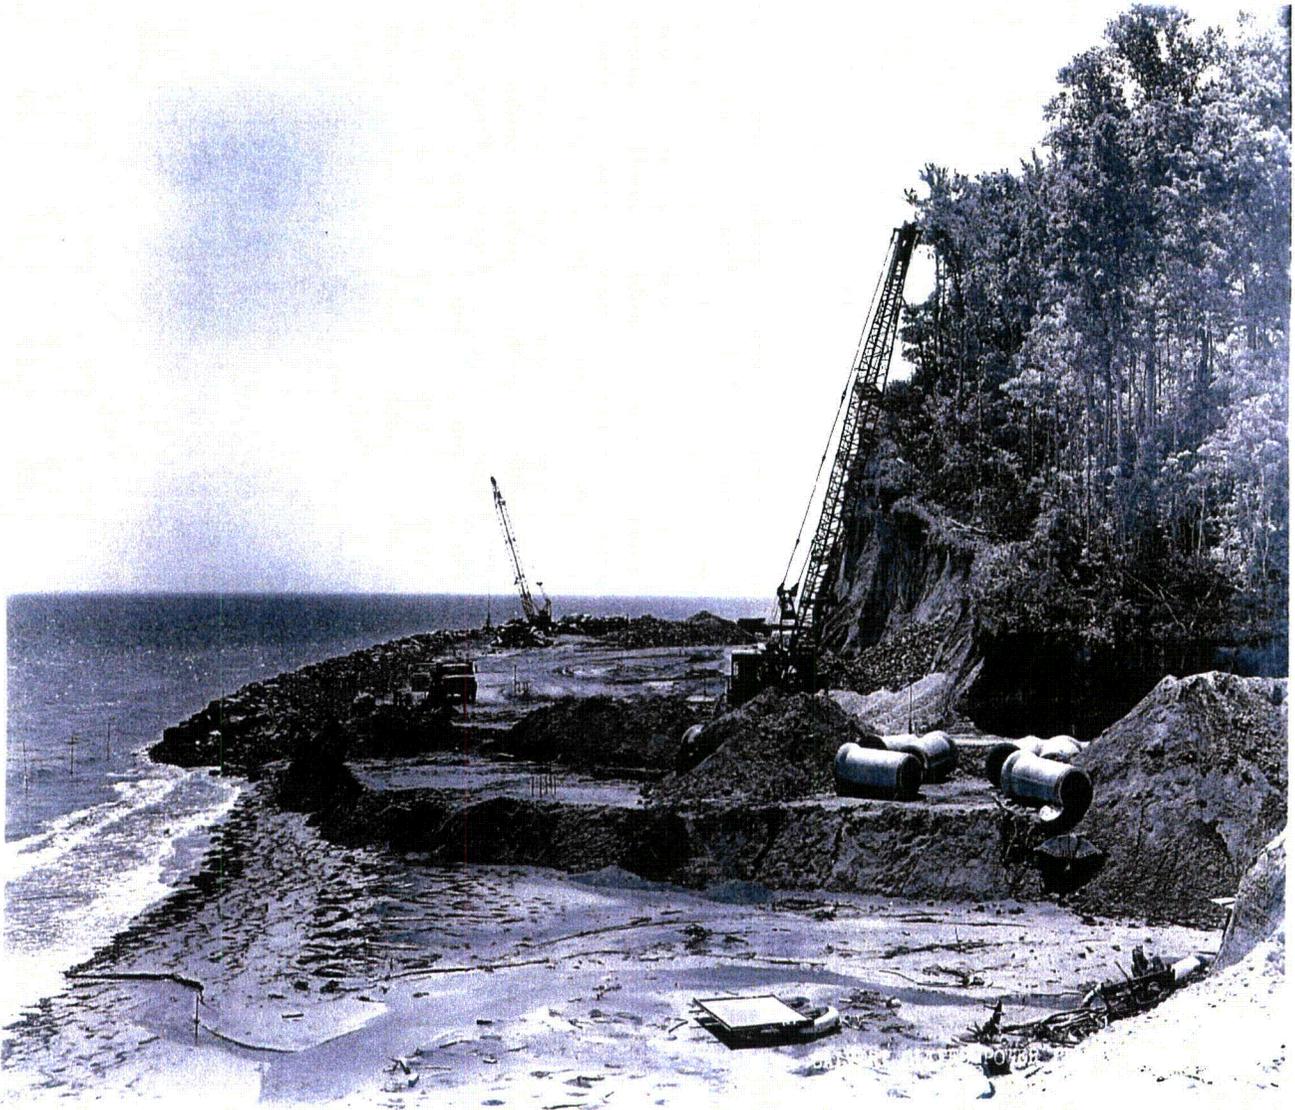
Aerial Overview of CCNPP During Construction (2/16/71) Showing Disturbed Shoreline, Man-Made Floodplain (Landfill) and Barge Dock/Slip in Area of CC3 Project Area Expansion, Facing Northwest
